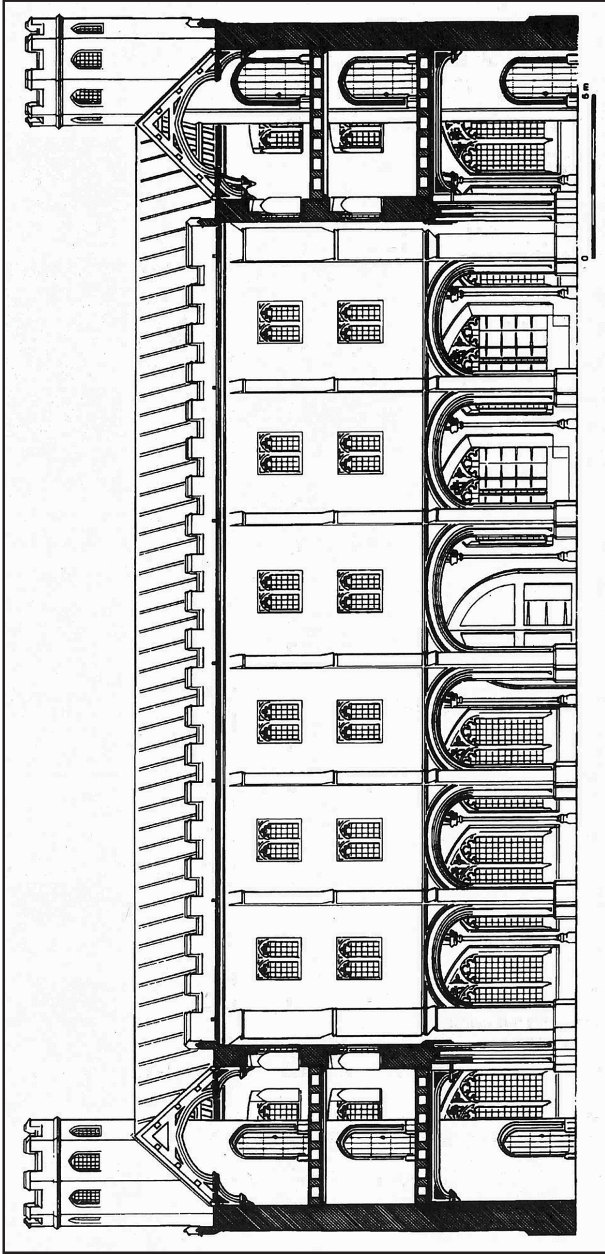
Leadenhall: reconstructed section from east to west (Museum of London)
